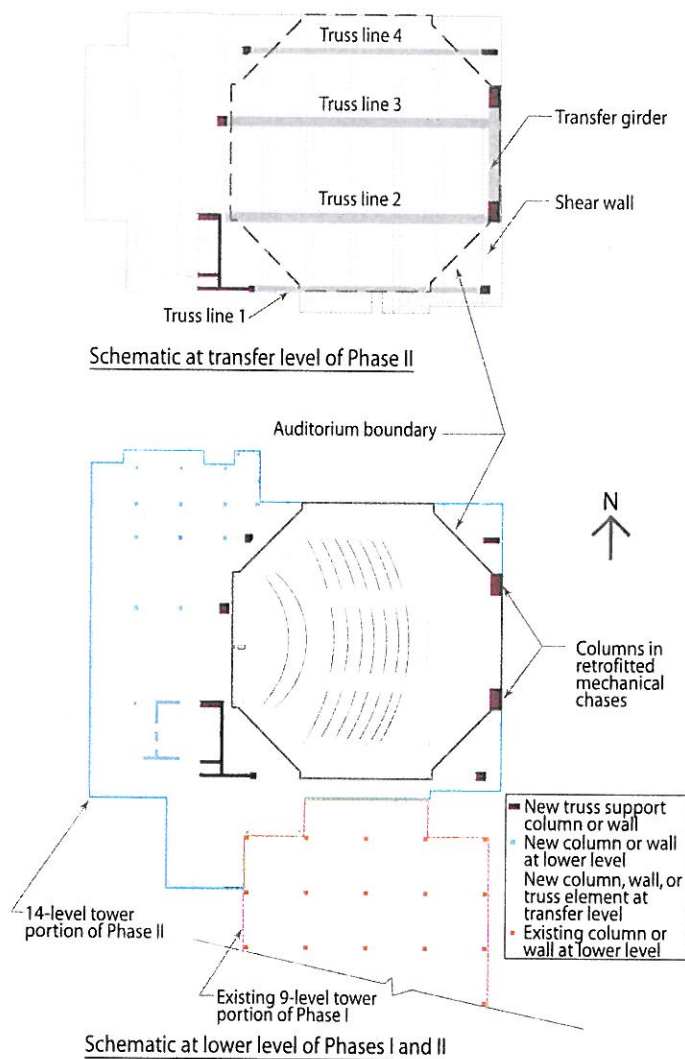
Plans at ground floor and at transfer truss bottom chord (Level 5)
